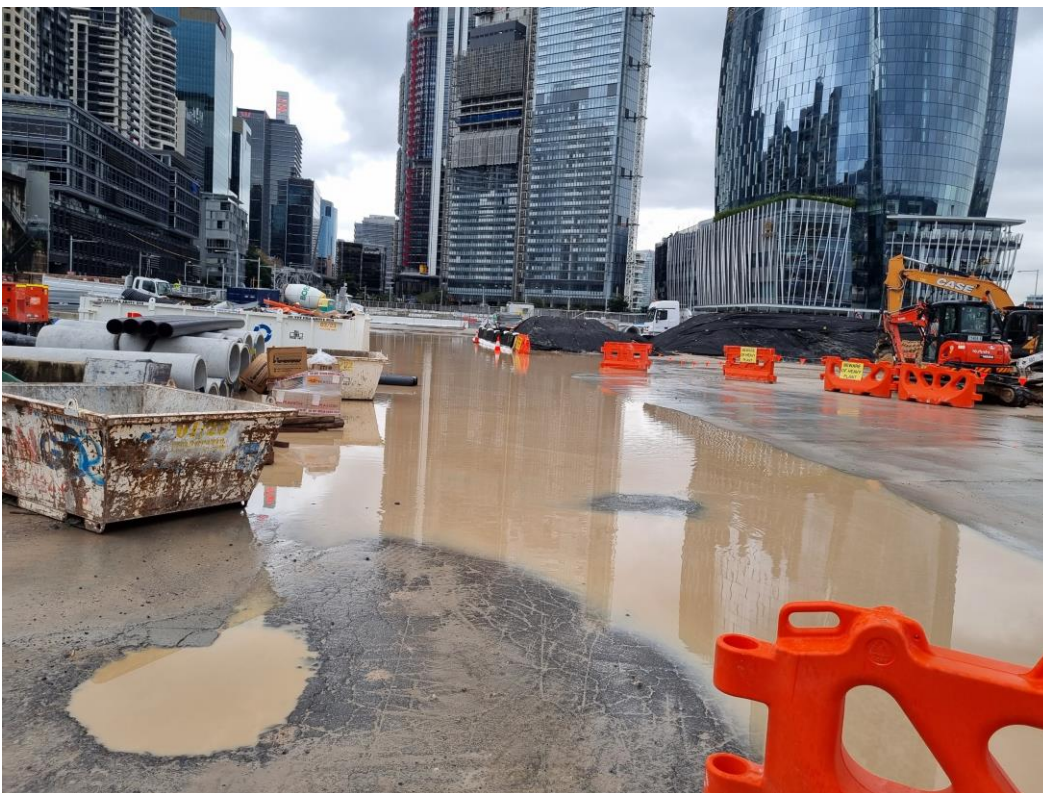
Internal stormwater sump, note covered stockpiles in background
